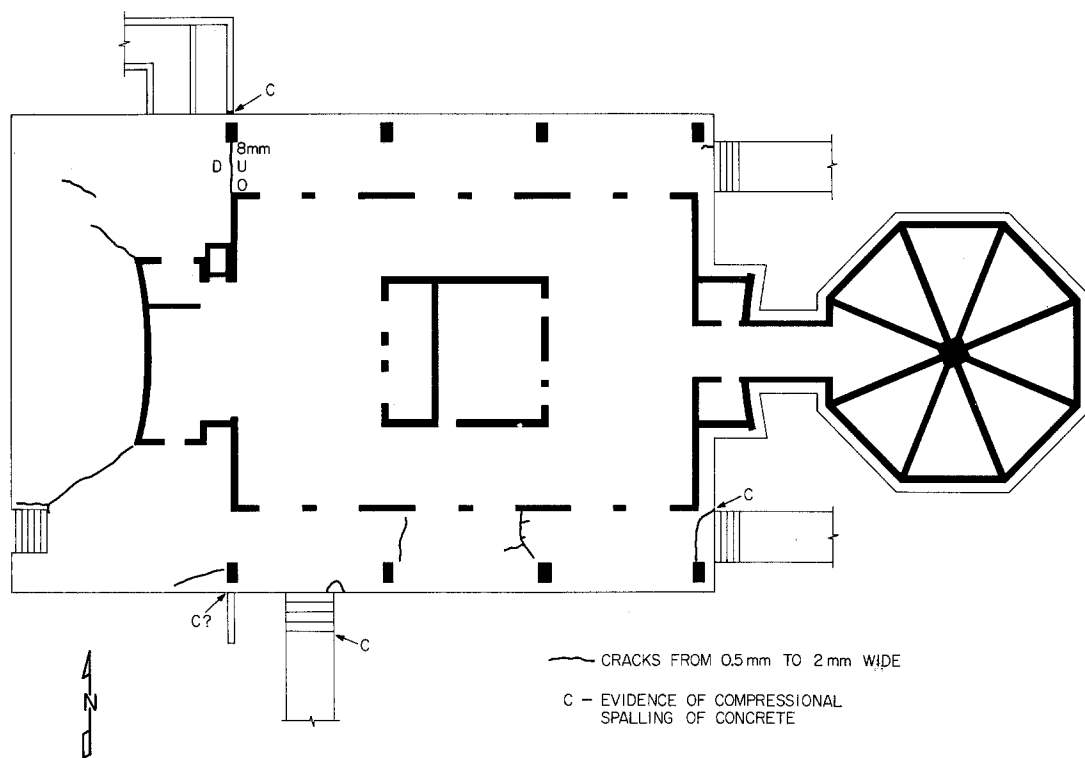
Plan view of ground level of Millikan Library showing locations of spalling of concrete and major cracks.
